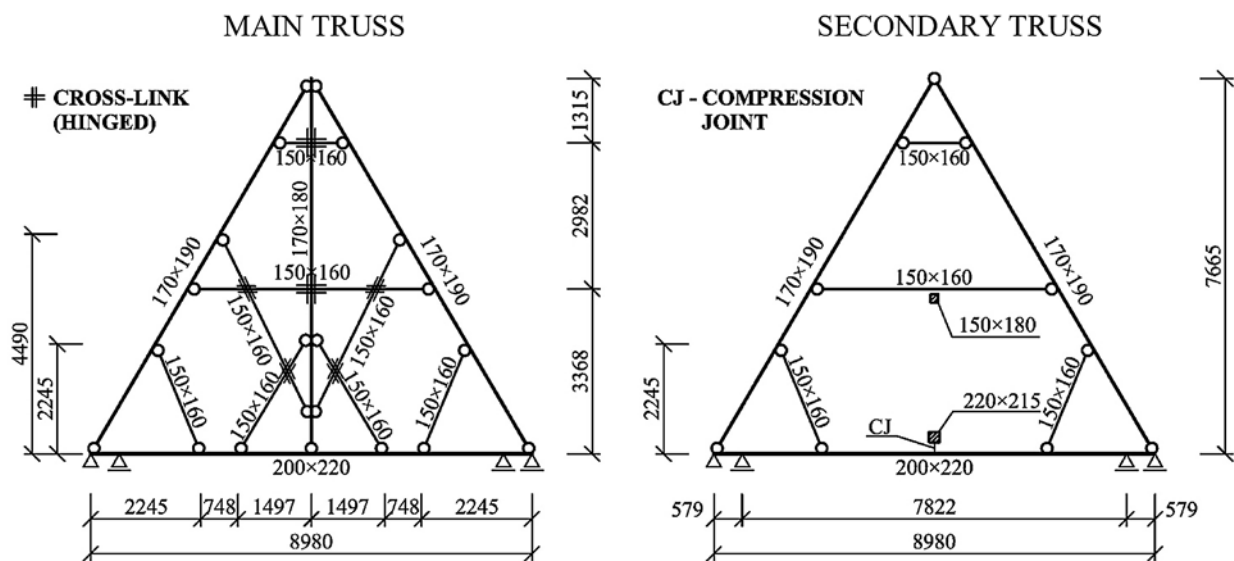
Numerical model cross trusses of the roof structure in Okolicne
